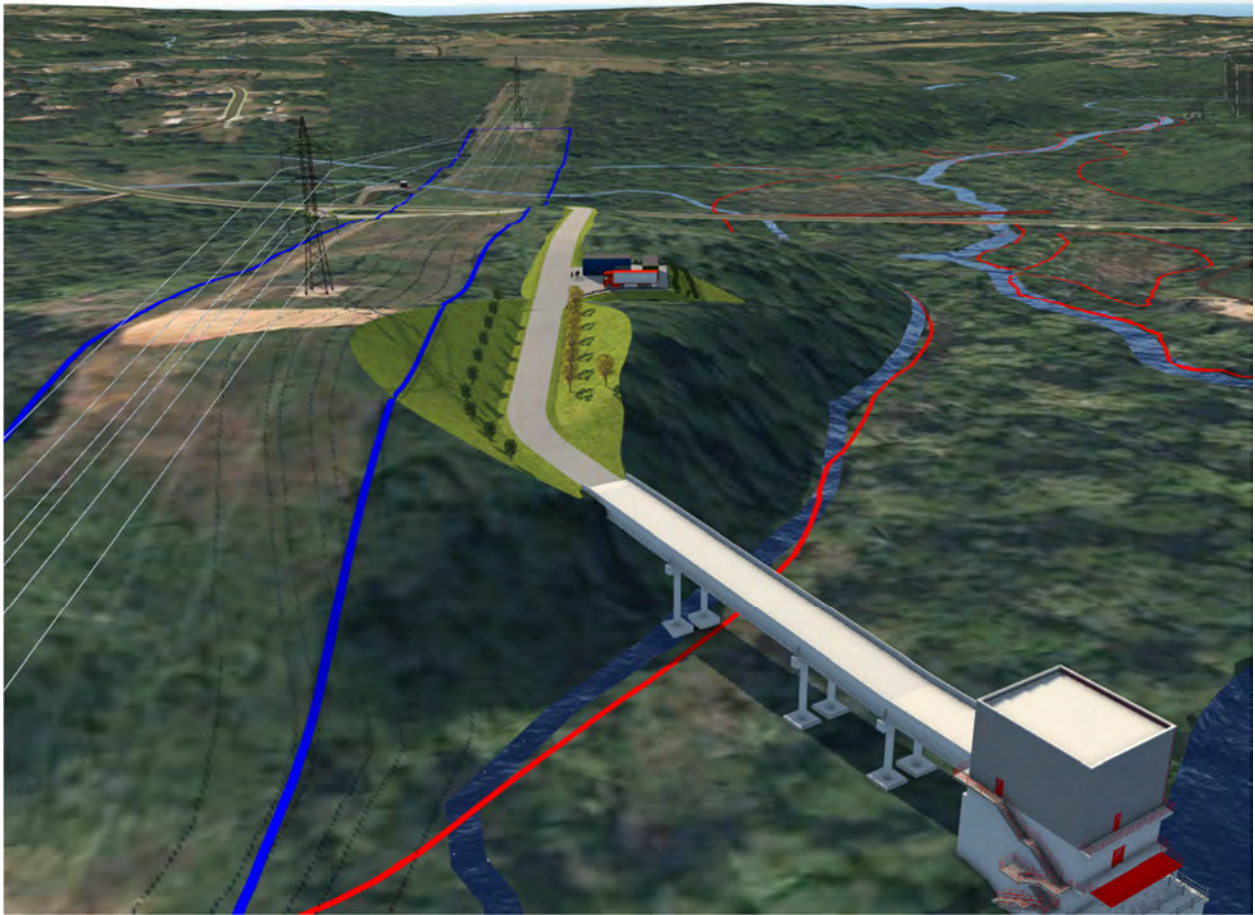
Aerial View Showing Project Site Elevation Differences and Simulated Project Infrastructure
